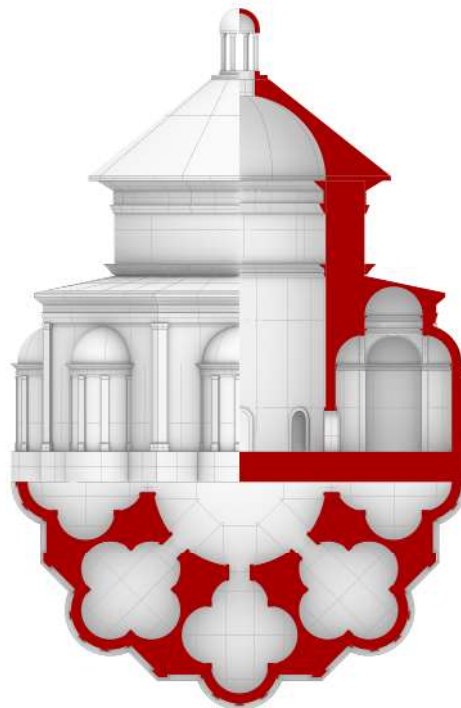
Plan, section and elevation (1:500) of the 3D model.
